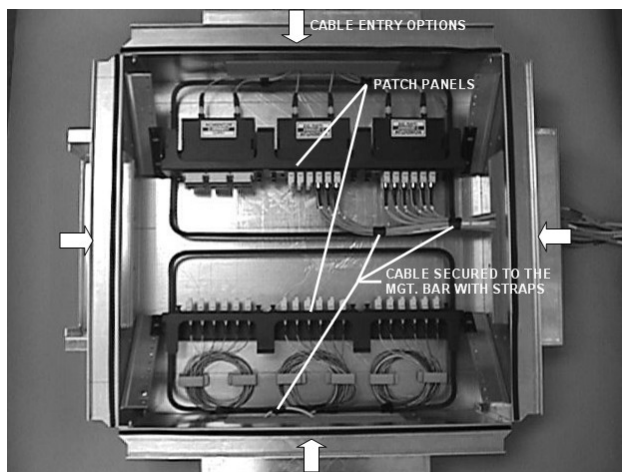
Raised Floor Patch Panel System for Cassette-based Application
